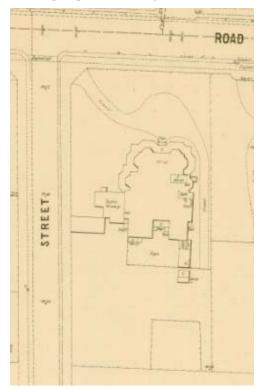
1902 MBW Plan (rotated) showing Blairholme' (source: State Library of Victoria, Plan 1763).
